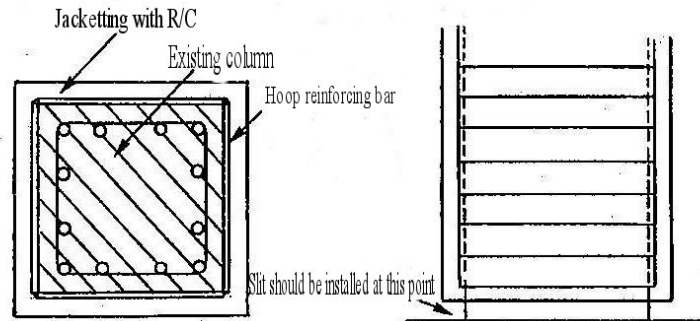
Schematic drawing of slit that is made at the column end
